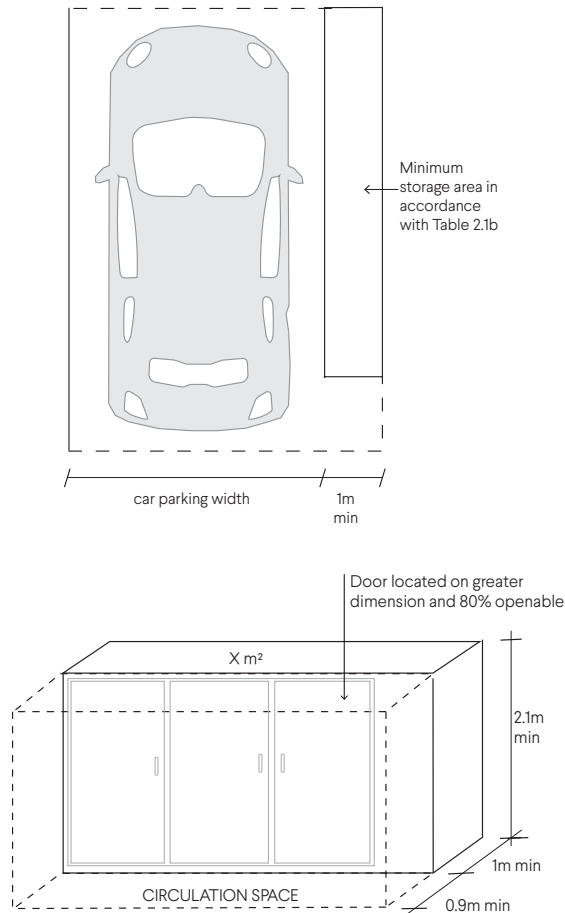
Minimum storage dimensions with adjacent circulation space
